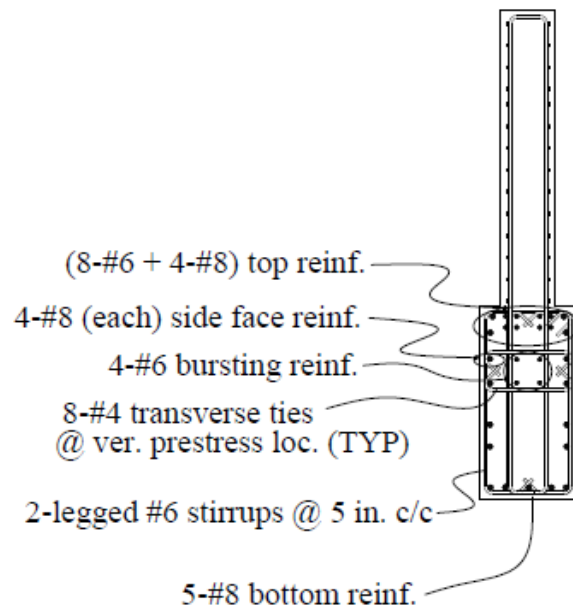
Section details for wall and foundation (Walls 1 and 4)
